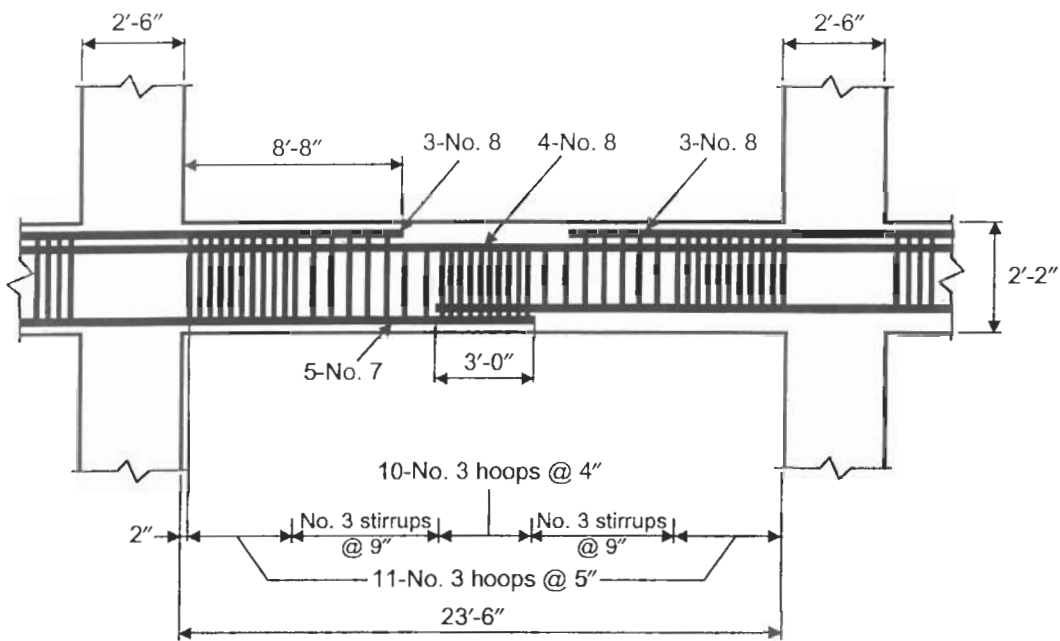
Reinforcement Details for Beam C4-C5 at the 2<sup>nd</sup> Floor Level (SDC D)
